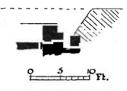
SECTION OF WEST WALL OF CHAMBER XXXIV.
